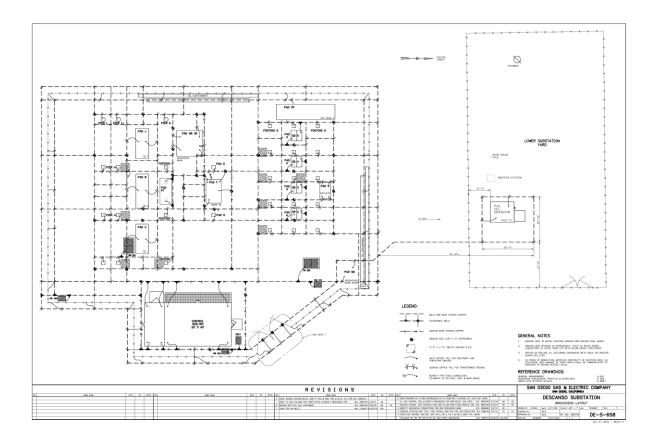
SDG&E Grounding Layout for Descanso Substation
